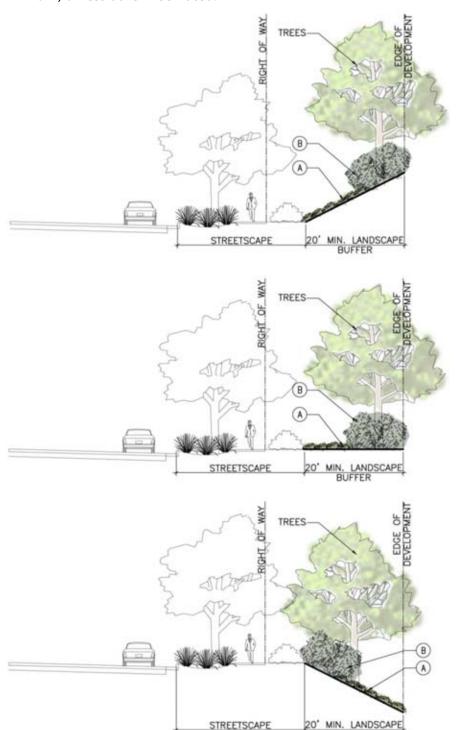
Slope Planting Guideline (From Top: Up-slope, Flat-slope, Down-slope)
